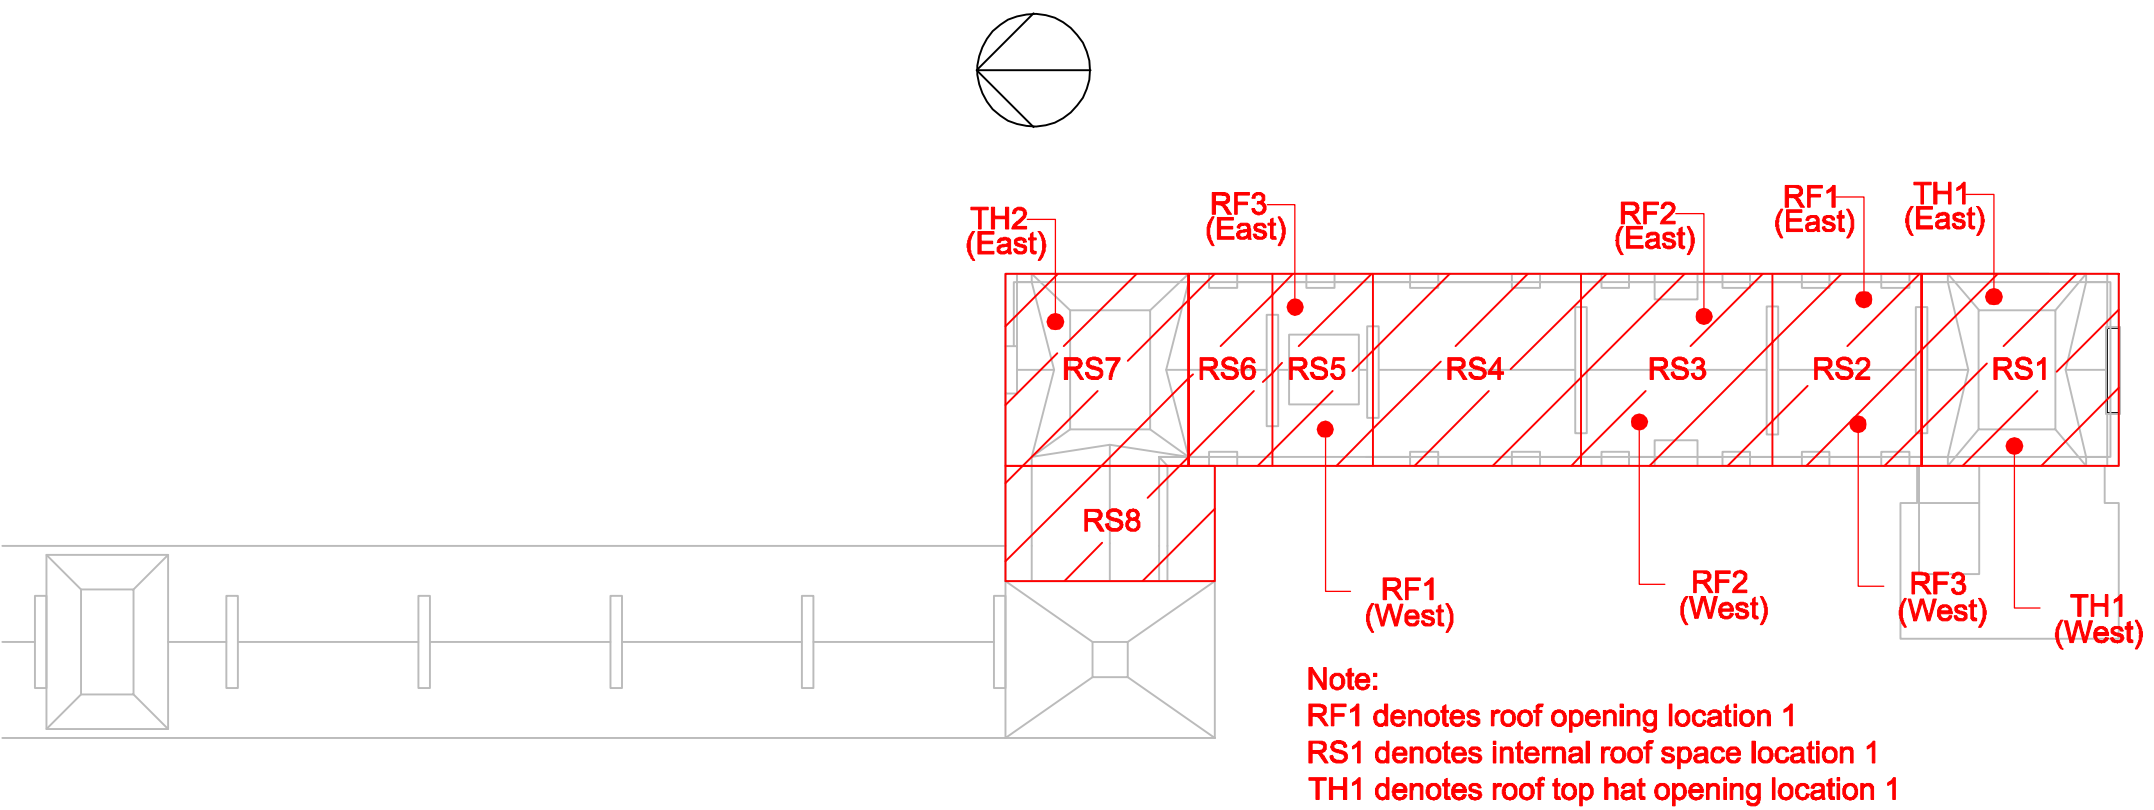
Plan of Station Hotel Building South Block showing Internal Survey Defect/Observation Locations of Roof Space and Roof Openings
